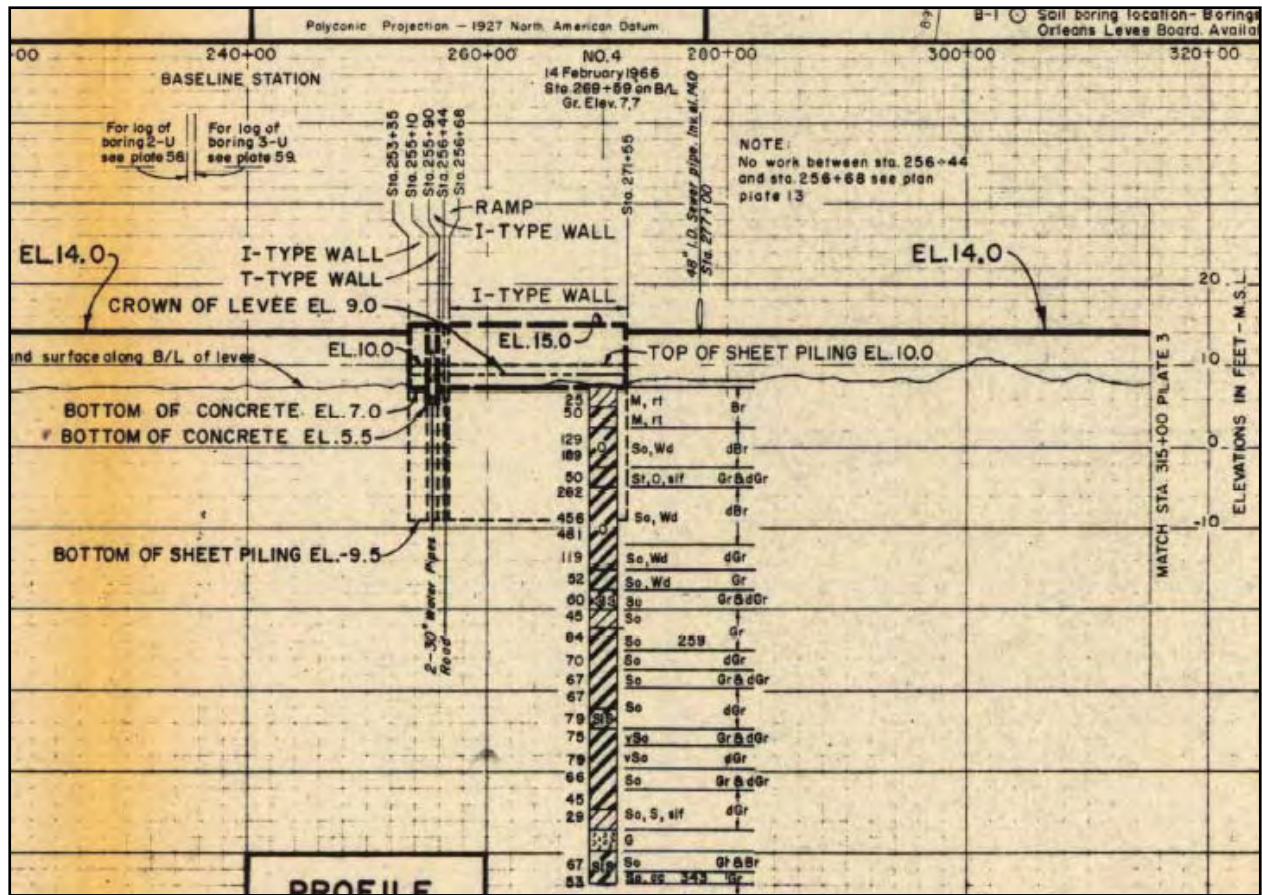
Nearby Boring 4 Shows Top Layer of Lean Clay (CL) (from Plate 2 profile section of DM2, General Design Citrus Back Levee, Aug 1967, drawing file H-2-23908)
